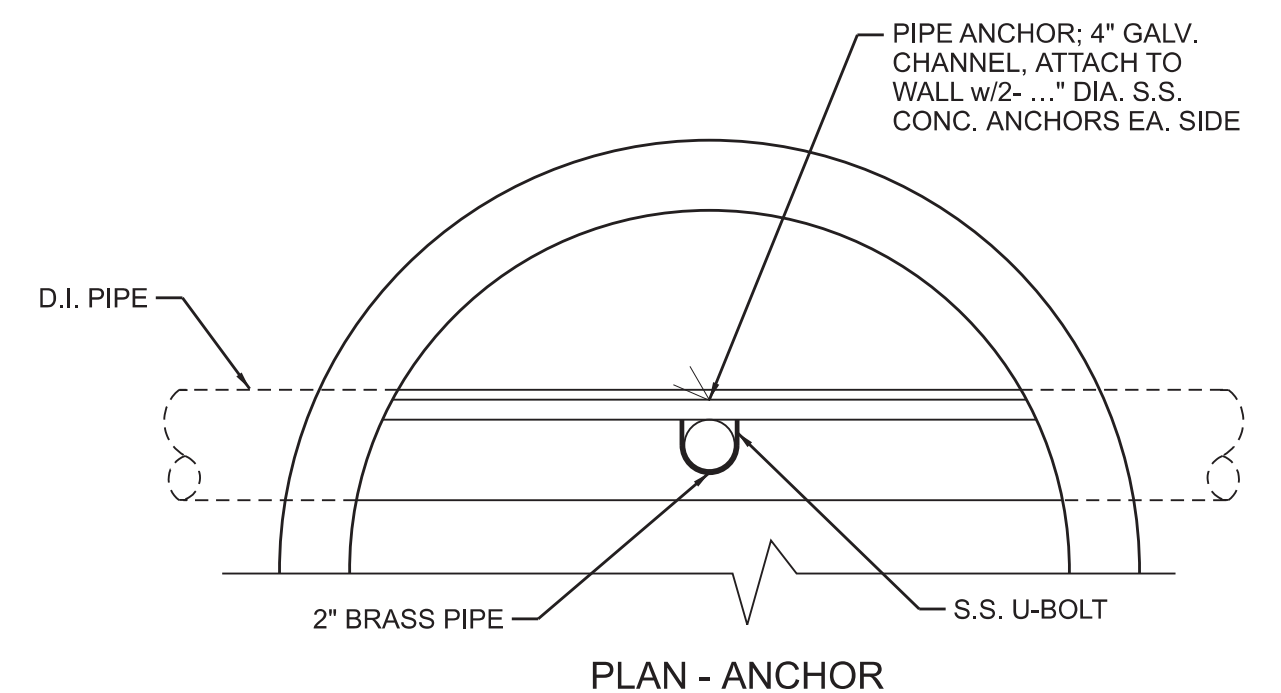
DETAIL - TYPICAL WATER SERVICE ASSEMBLY
